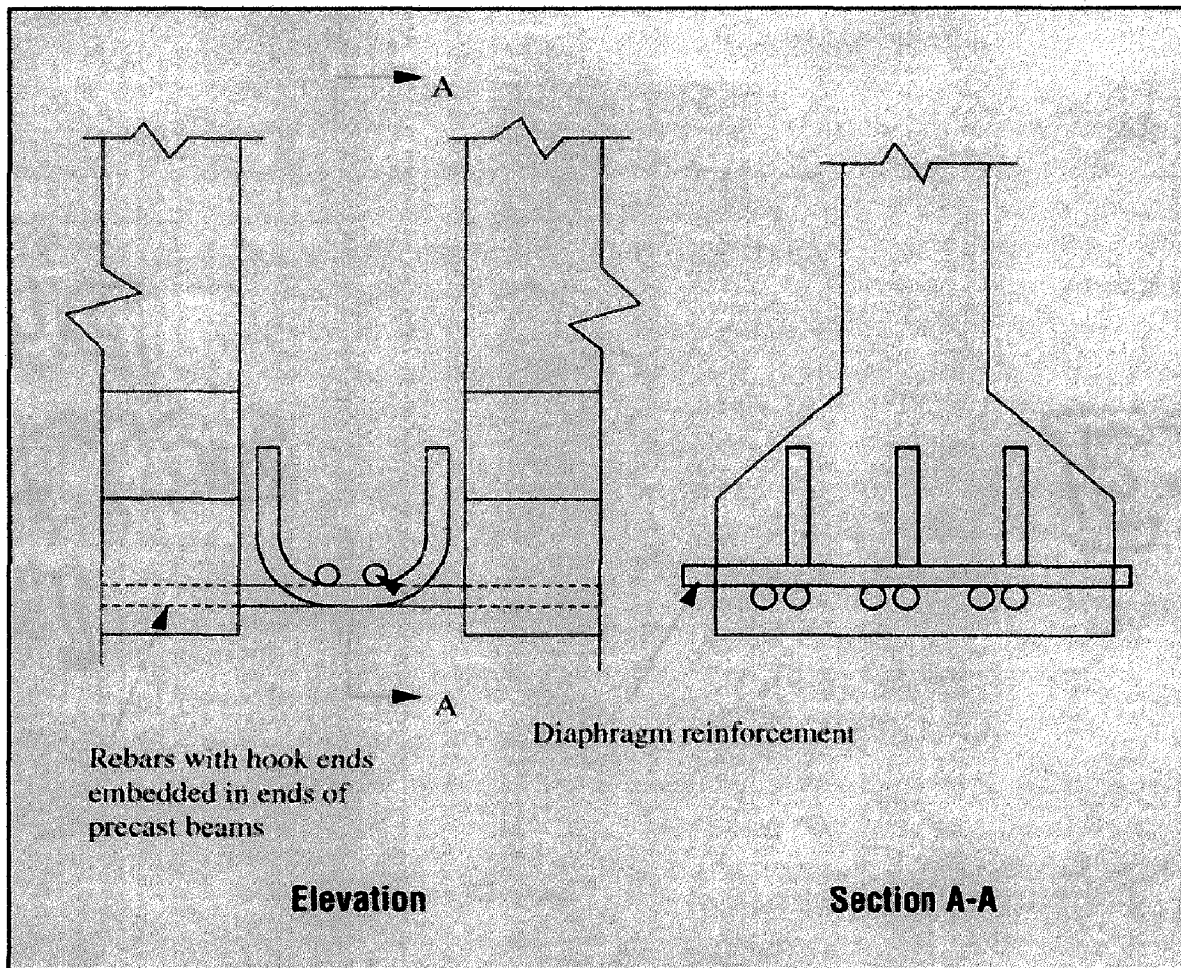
Positive Restraint Moment Connection Details by Embedded Reinforcing Bars (Ma et al., 1998)
